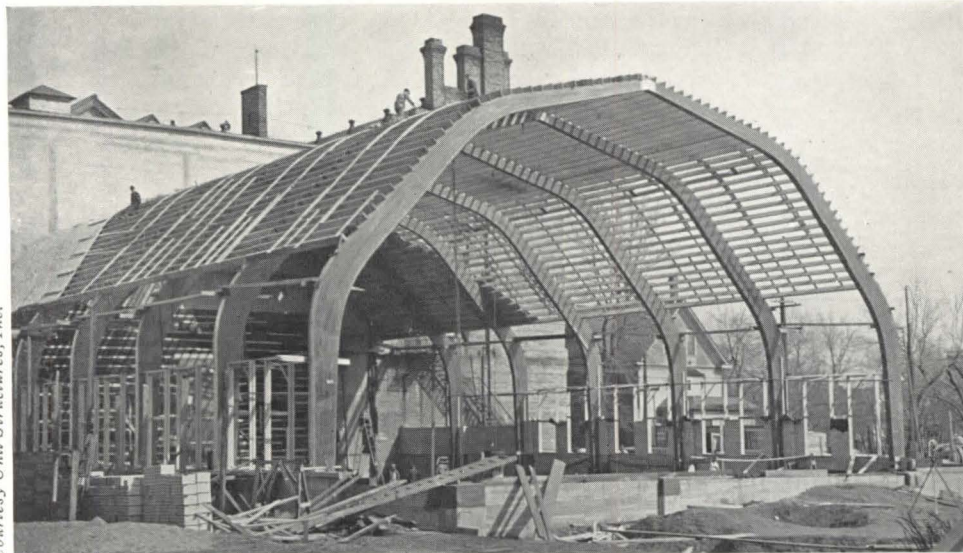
Hinged arches of laminated wood are employed to span this large auditorium.
